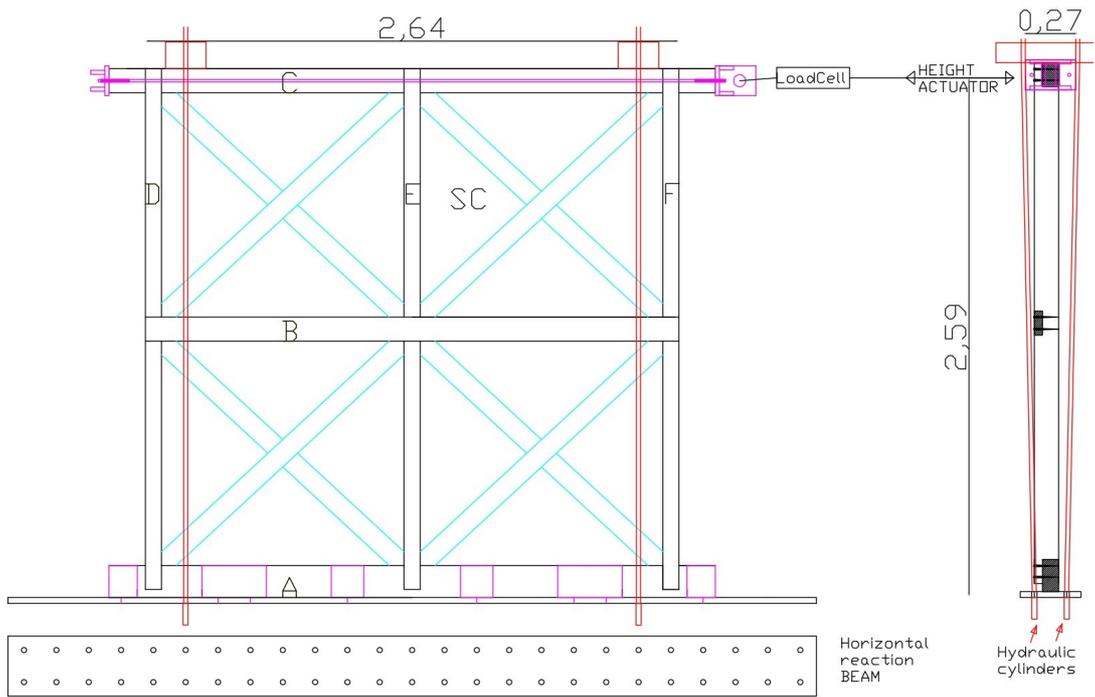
Schematic drawing of experimental set-up of specimen SC (units in meters).
